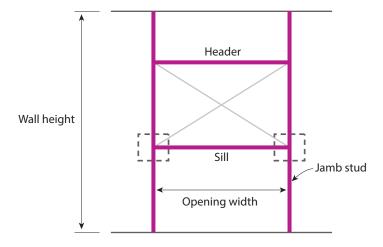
Sill S1 Connection 'cut and fold' Elevation
